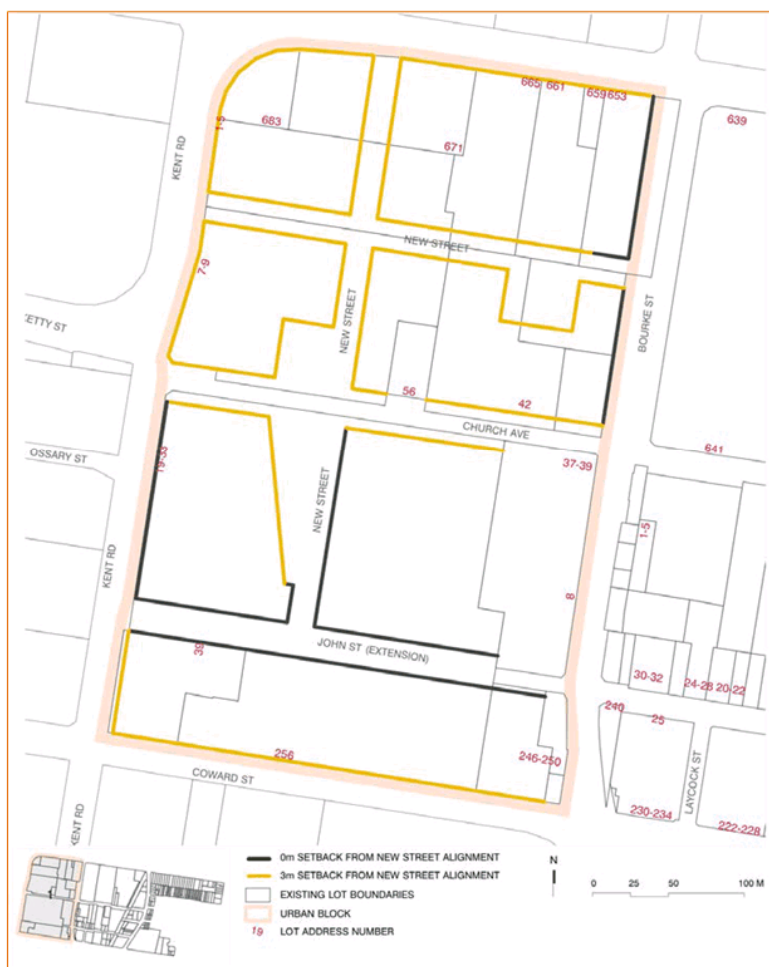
Setback - Urban block 1 (Level 5 to 13)
